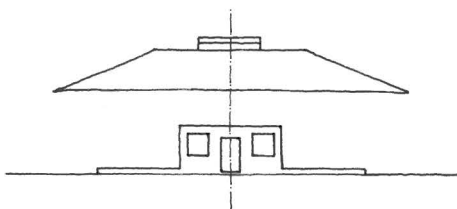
REINFORCEMENT and REPETITION in ARCHITECTURE.
